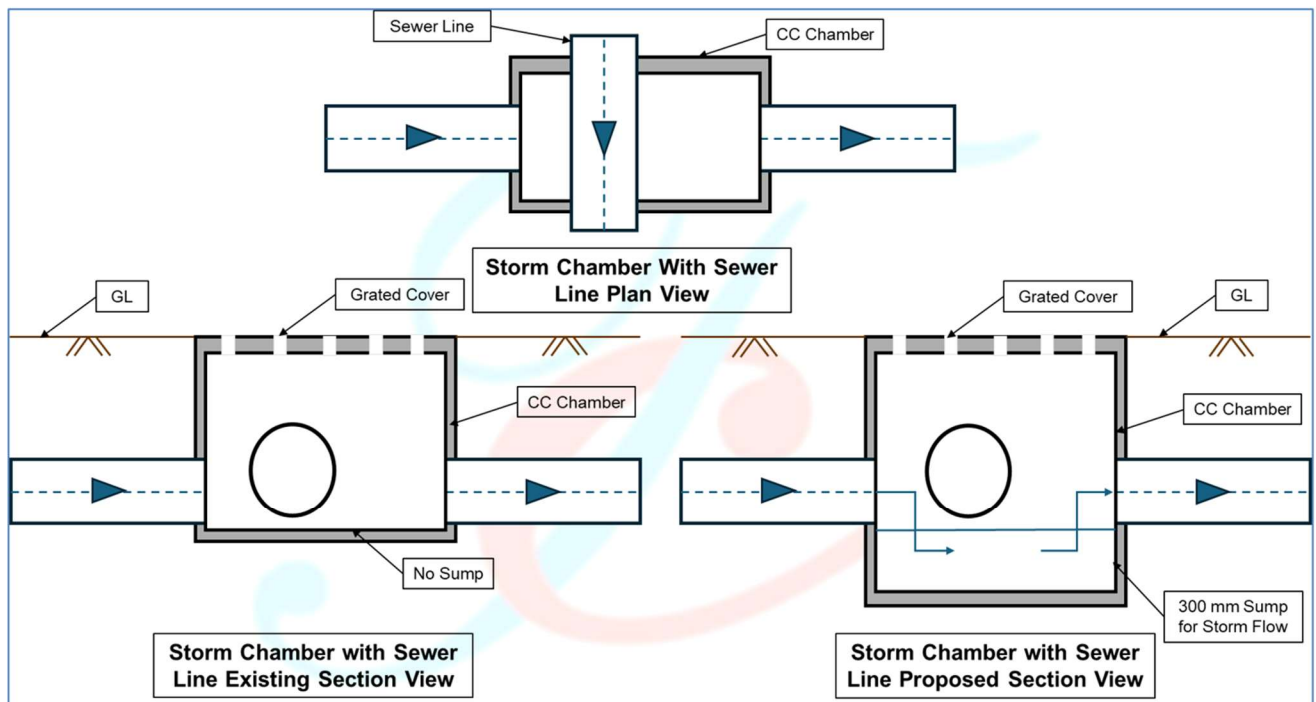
Existing and Proposed Schematic for Storm Chamber with Sewer Crossing
